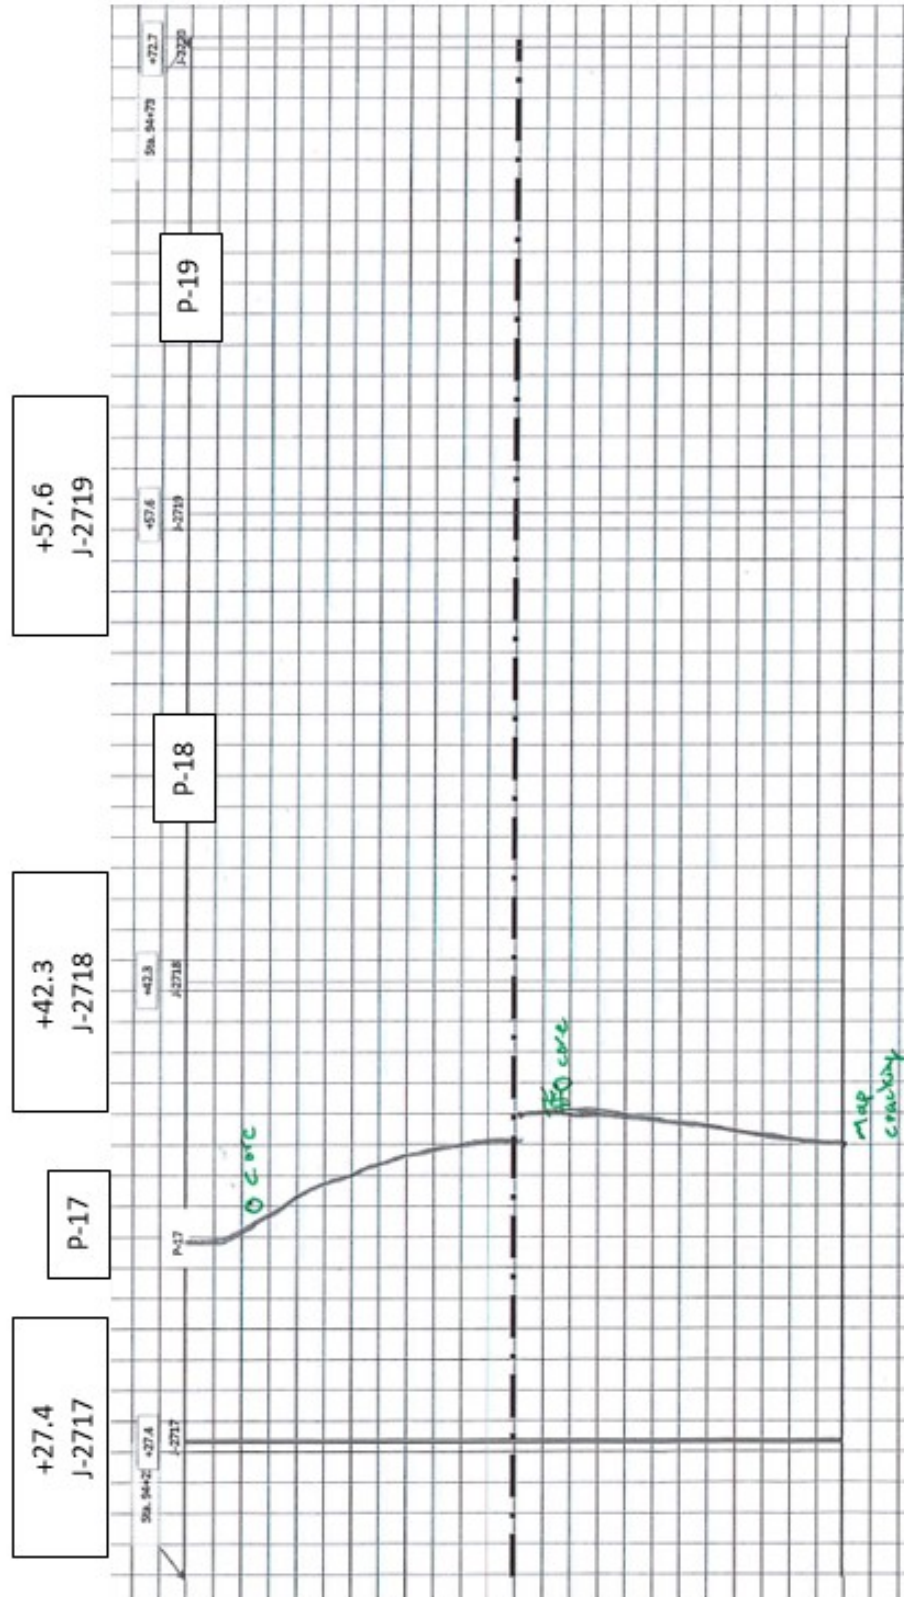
Schematic plan view of the cracking occurred on inside lane at cell 238
